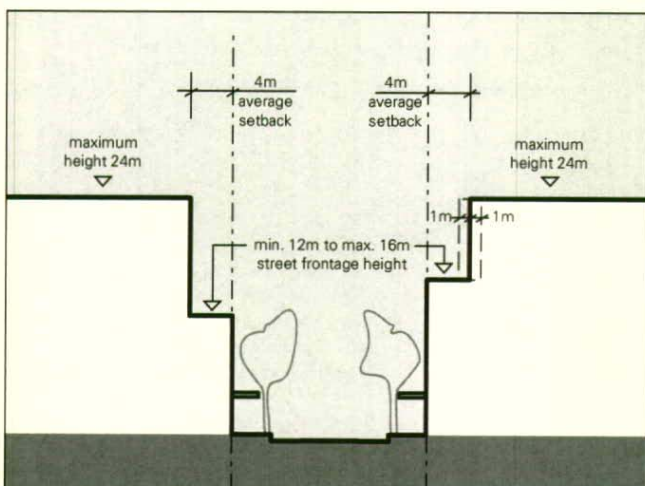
Street Frontage Height Type E. Street frontage height of new development should respond to existing adjacent built form and be in the range of 12-16 metres. Above the street frontage height buildings are to be set back 4 metres
